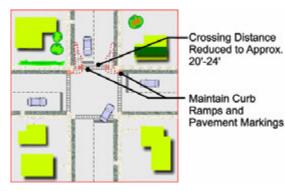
An example of bulb-out placement to reduce curb radii and shorten travel distance for pedestrians crossing at an intersection.
